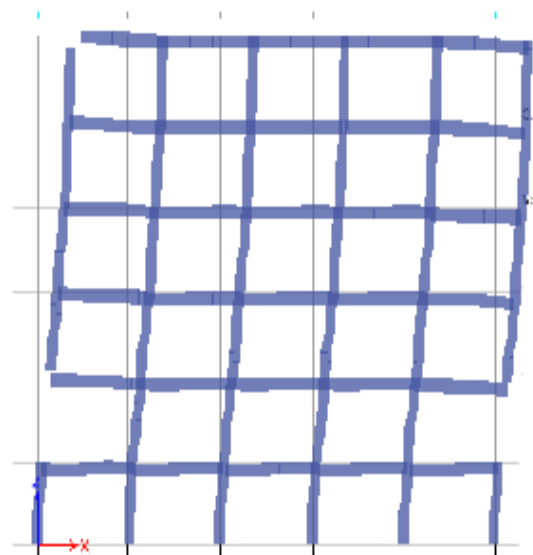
Deformed shape of building with FC at ground floor edge corner
